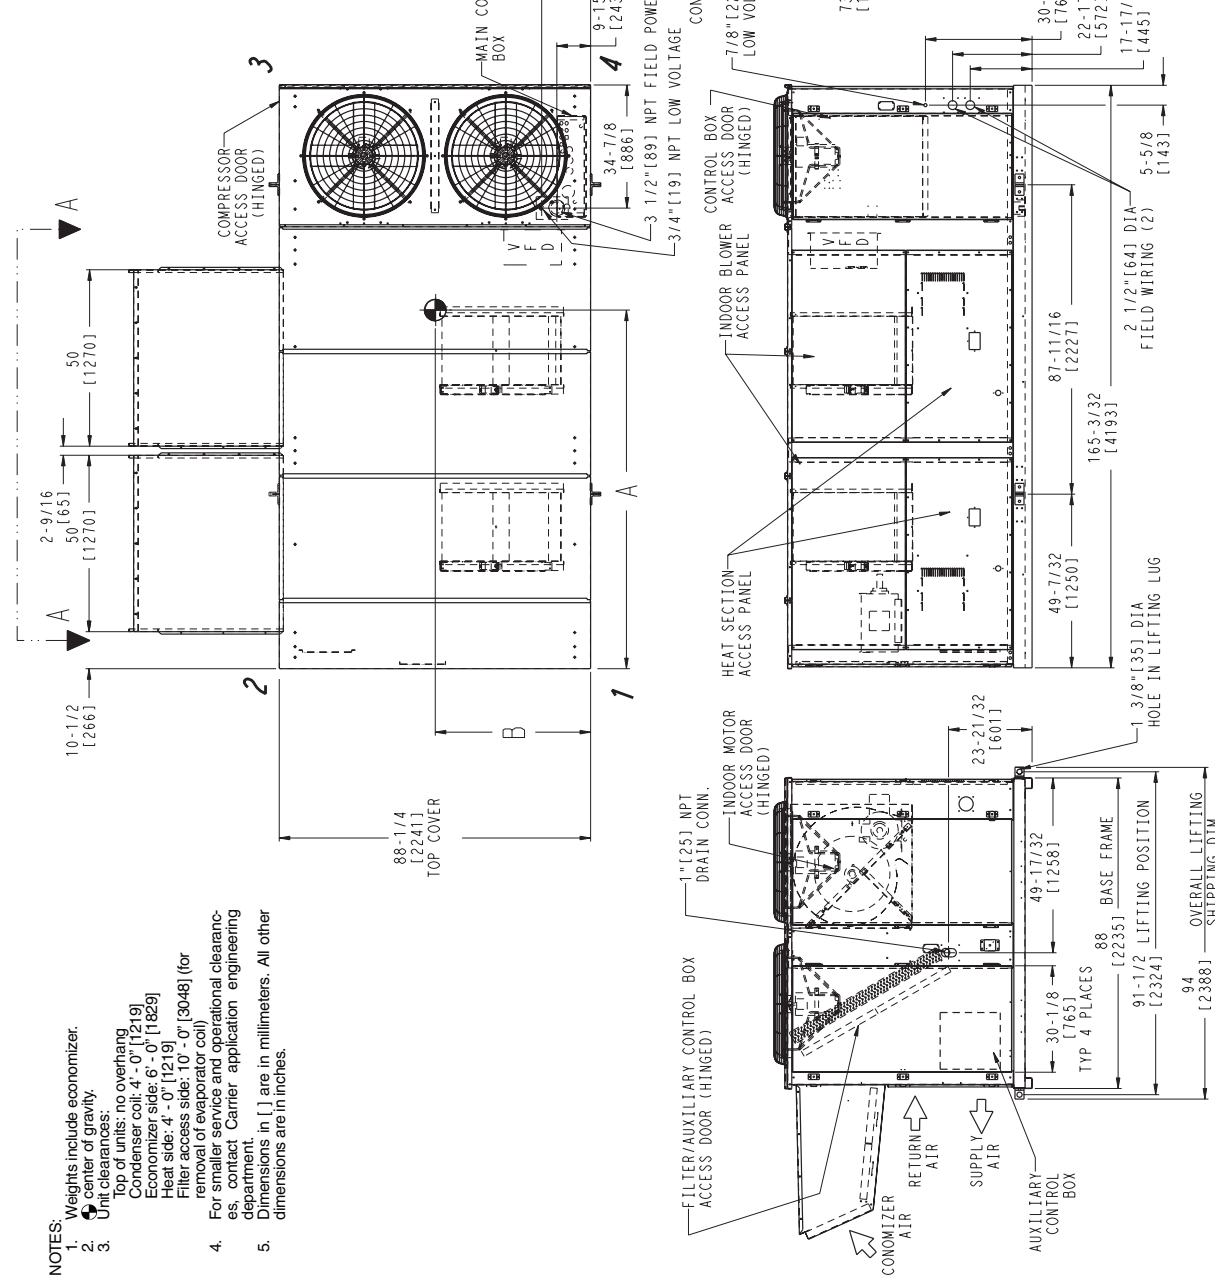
Base Unit Dimensions — 50A2,A3060
